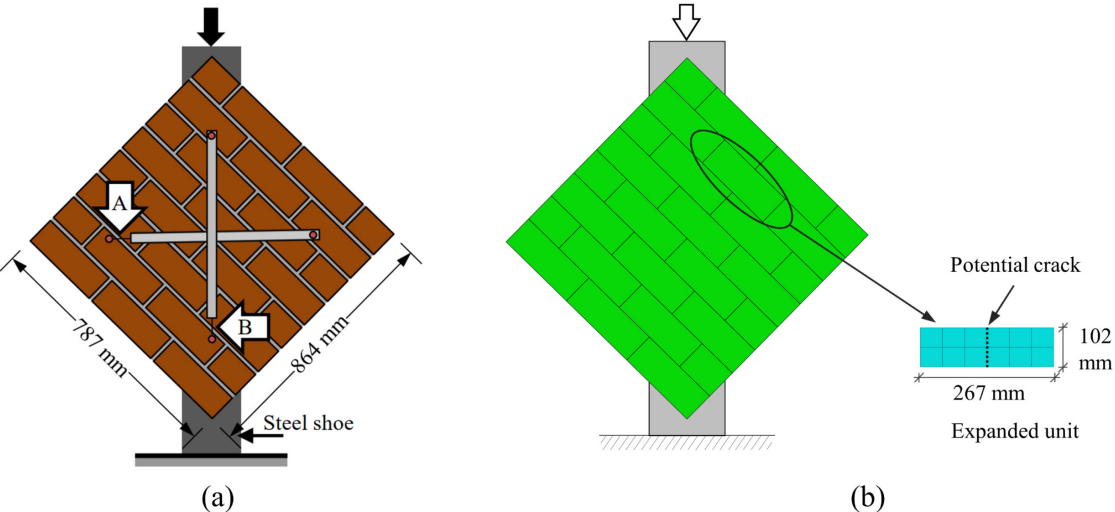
CSEB masonry wallette: (a) test setup and (b) SMM discretization.
